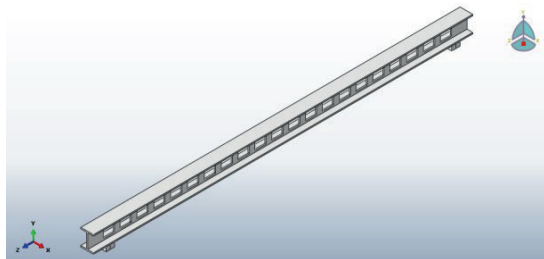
Modelling of loading pressure on top face of the steel beam sample
